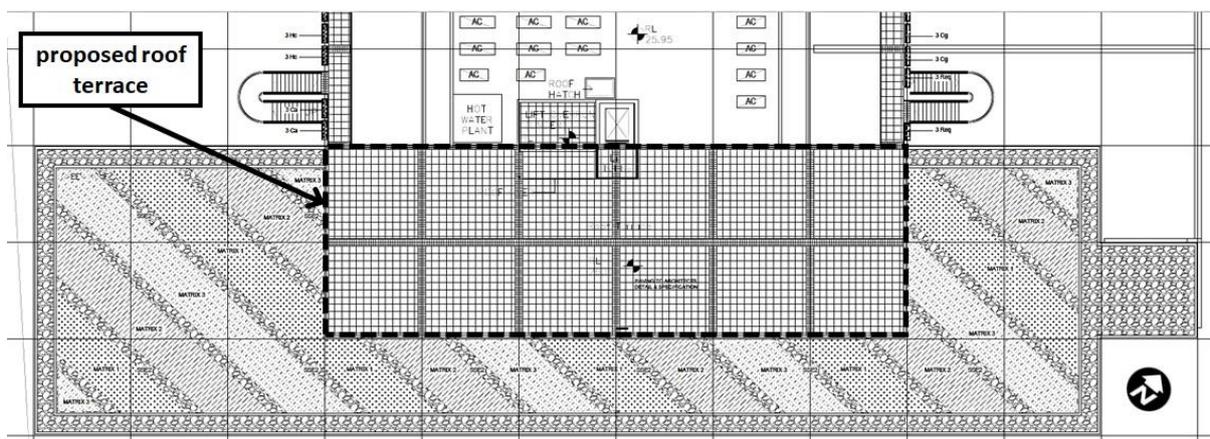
Proposed roof terrace lacks shading, furniture or facilities
